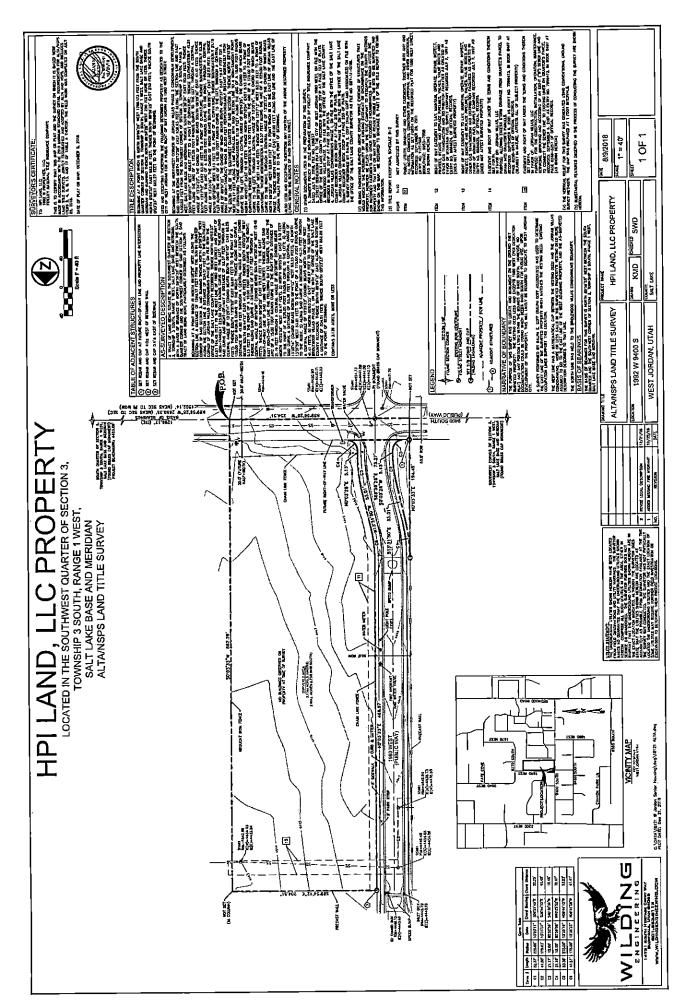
# EXHIBIT E SUBDIVISION PLAT AND 9400 SOUTH FRONTAGE IMPROVEMENTS
